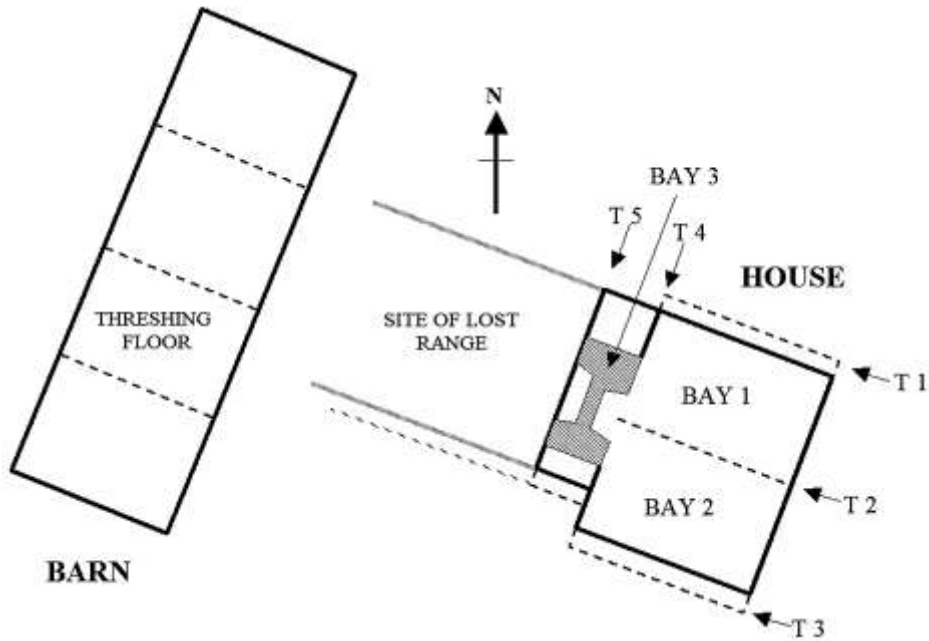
New House Farm, Moccas. Simplified layout plan showing the relative positions of the barn and house
